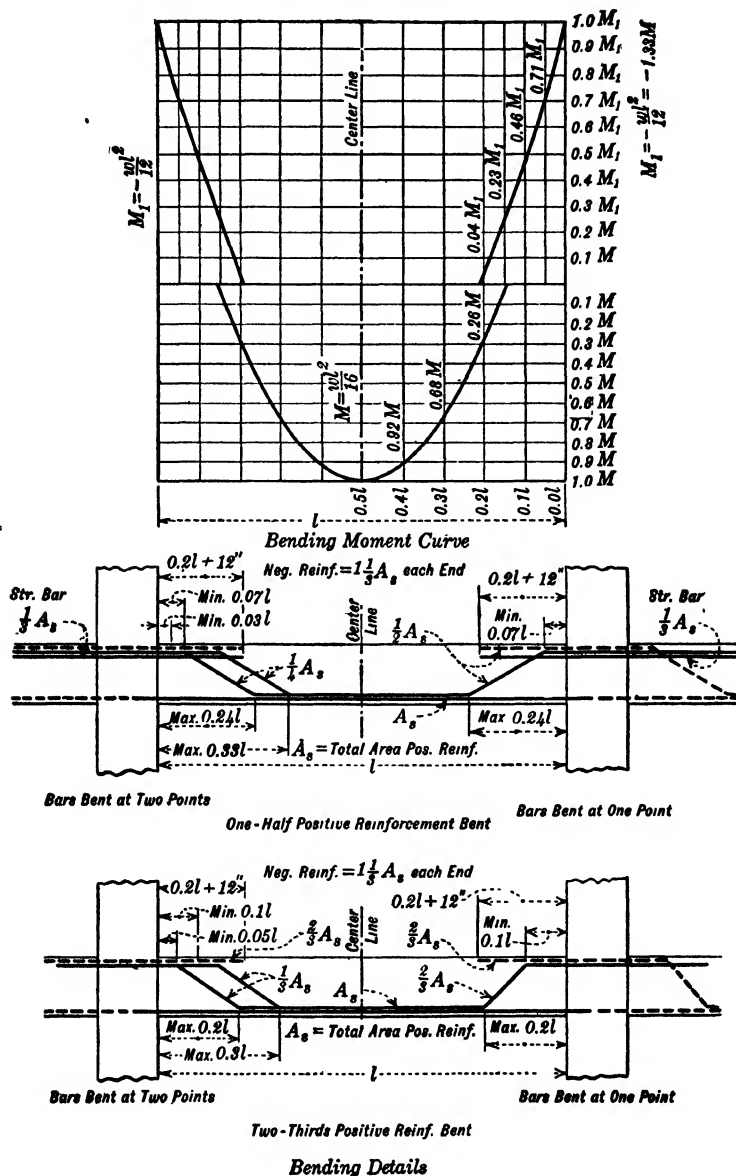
Interior Span of Building Frame. (See p. 290.)
